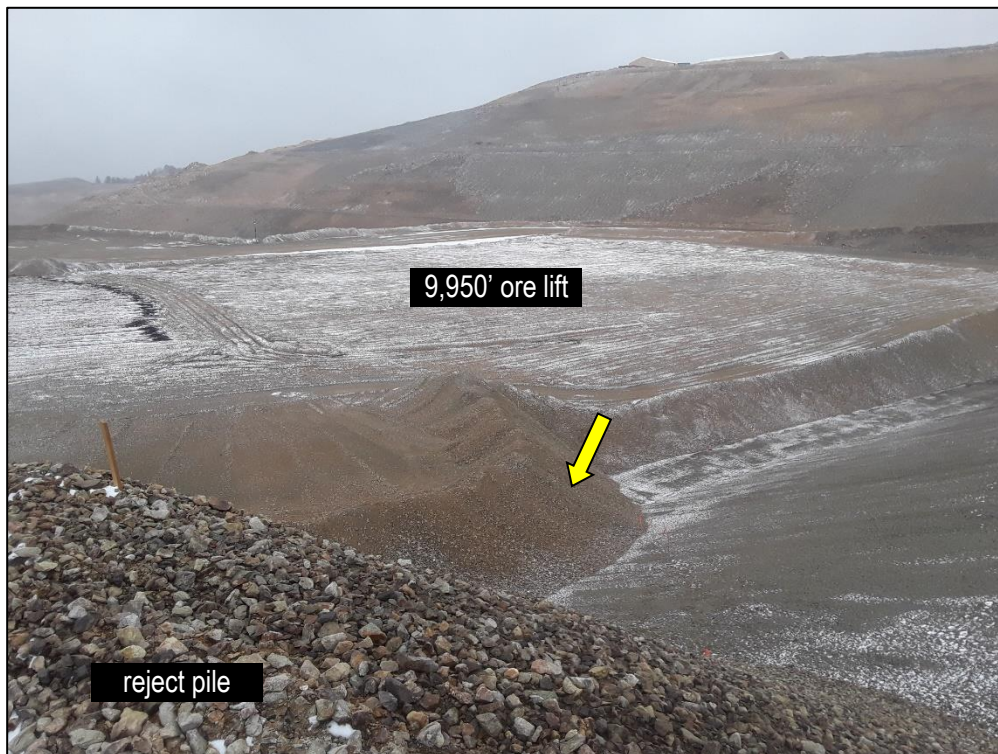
View looking northwest from edge of reject pile at 10,040 foot elevation (shown in Photo 16), showing pile temporarily buttressed by ramp from 9,950 foot ore lift (indicated with arrow).
